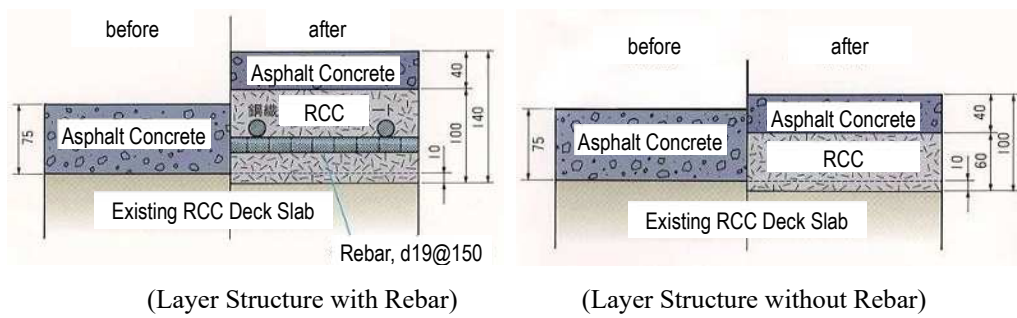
Typical Layer Structure of RCC Deck Slab Thickening Method
